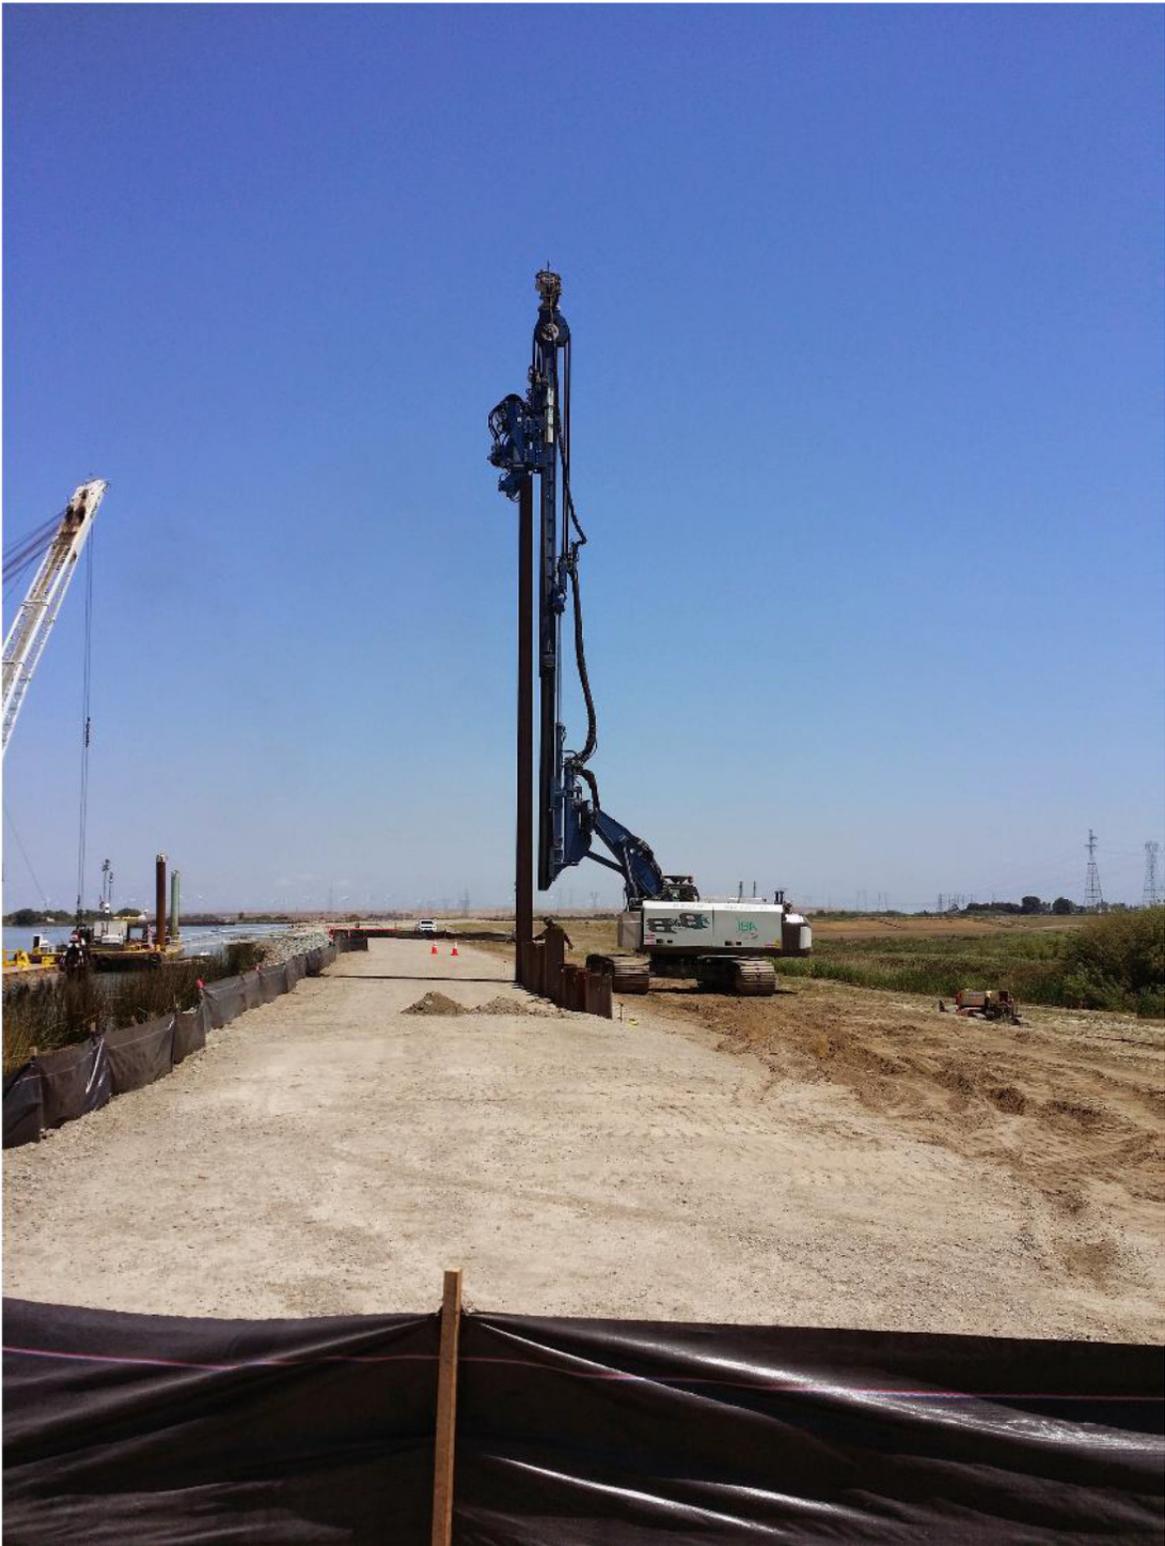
Hammering levee sheet piles on Jersey Island (May 8, 2015).
